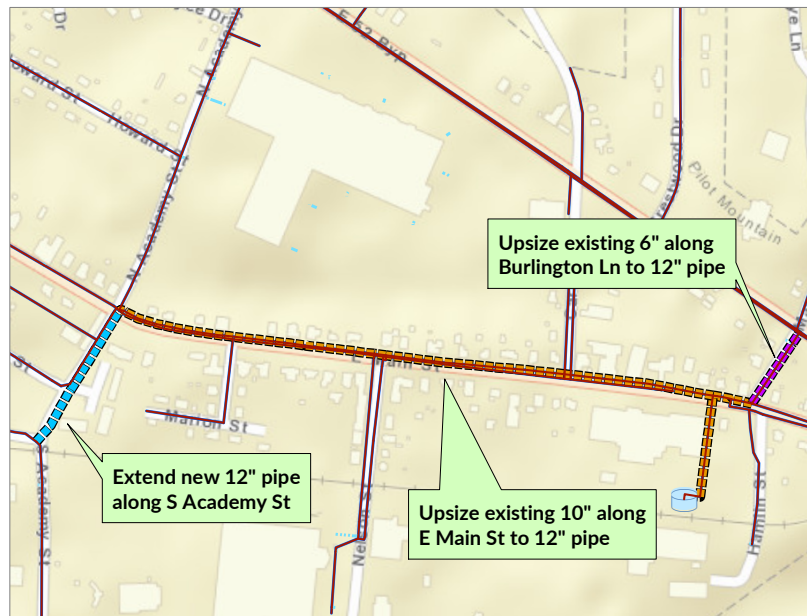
Proposed pipe improvement projects near Pilot Center tank
